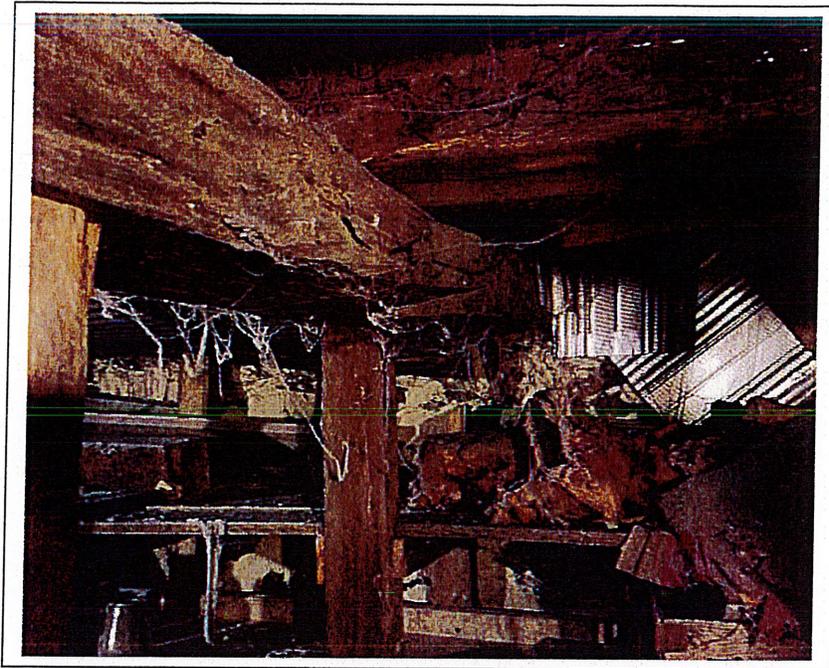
Timber Girder Supporting Floor Joists in Log Constructed Portion of Building
